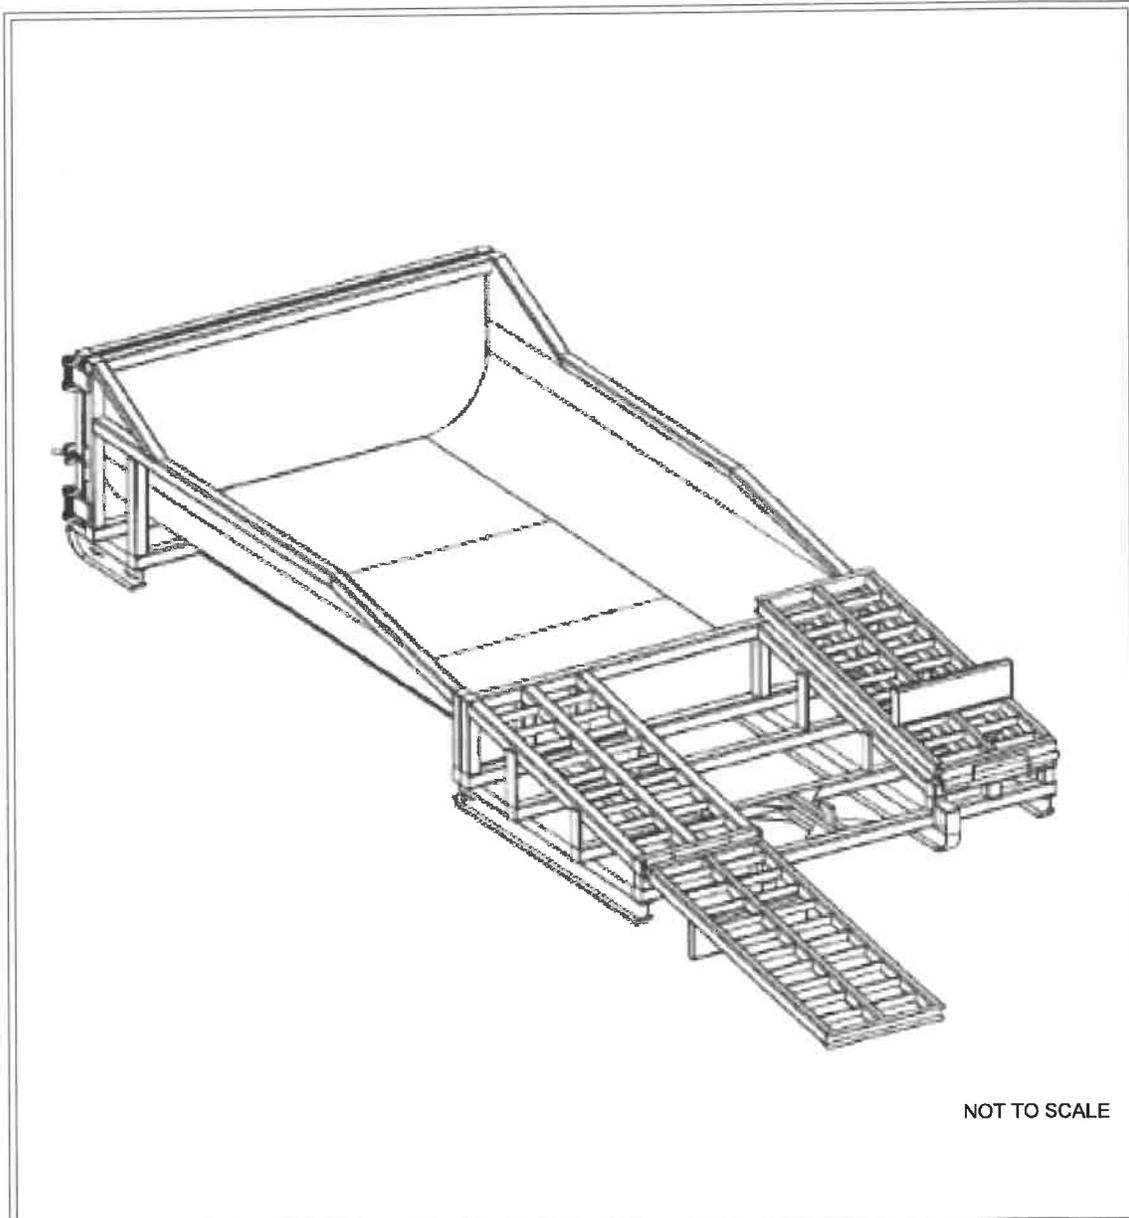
Prefabricated Concrete Washout Container with Ramp
